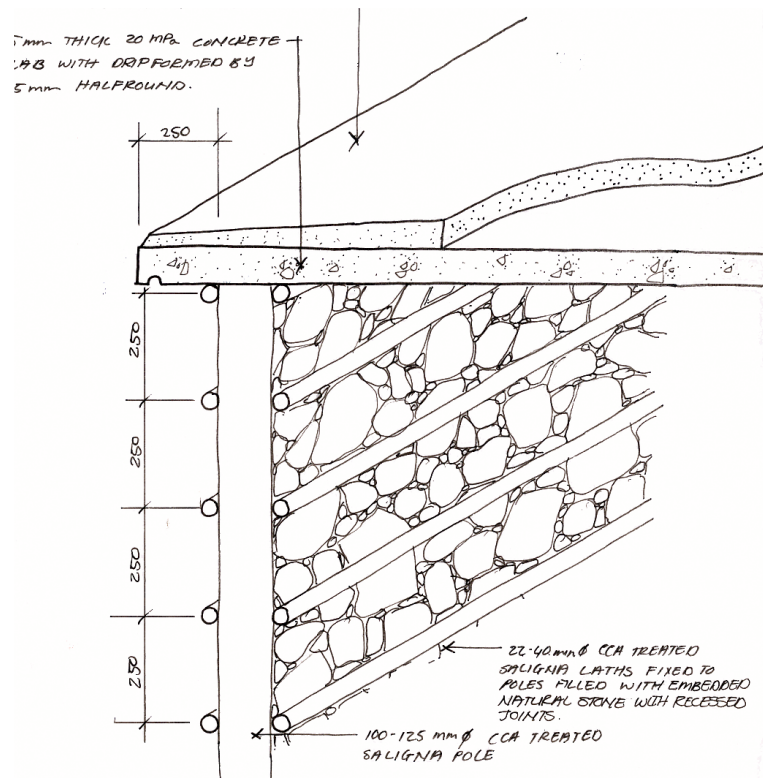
Isometric of Timber and Stone wall
